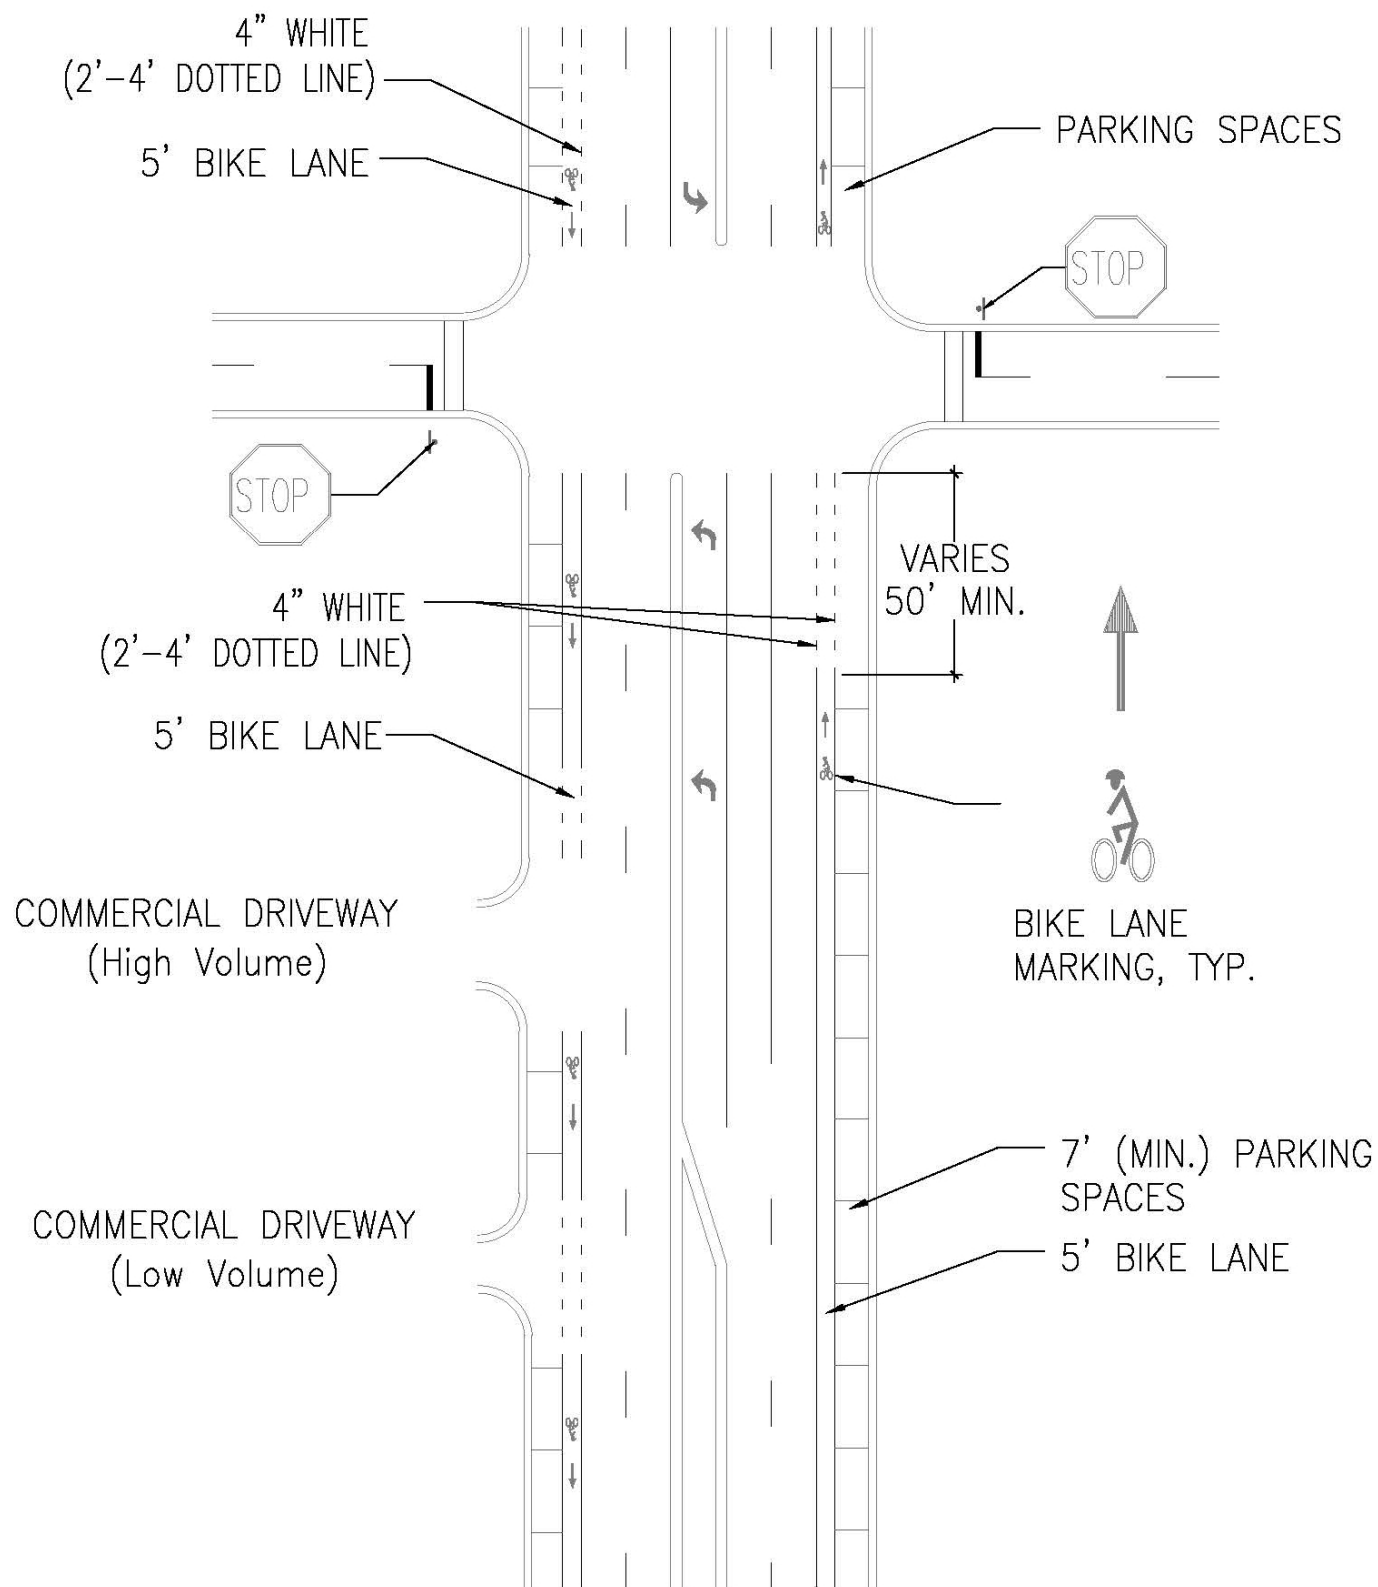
Typical Bike Lane - Major Intersection, No Right Turn Lane, On-Street Parking
